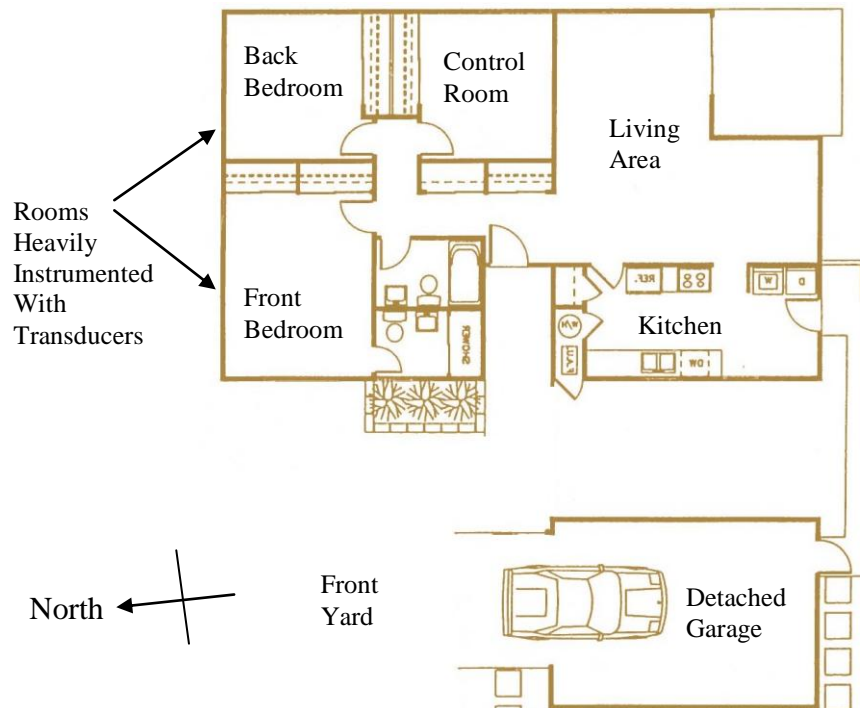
Floor plan of the house used in 2006 located at 7334 Andrews Avenue, Edwards, CA.
